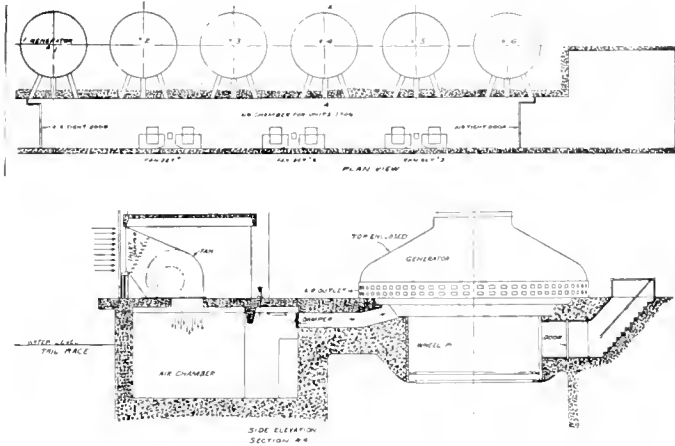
Plan and Sectional Elevation of Ventilating System for large horizontal slow-speed generators
